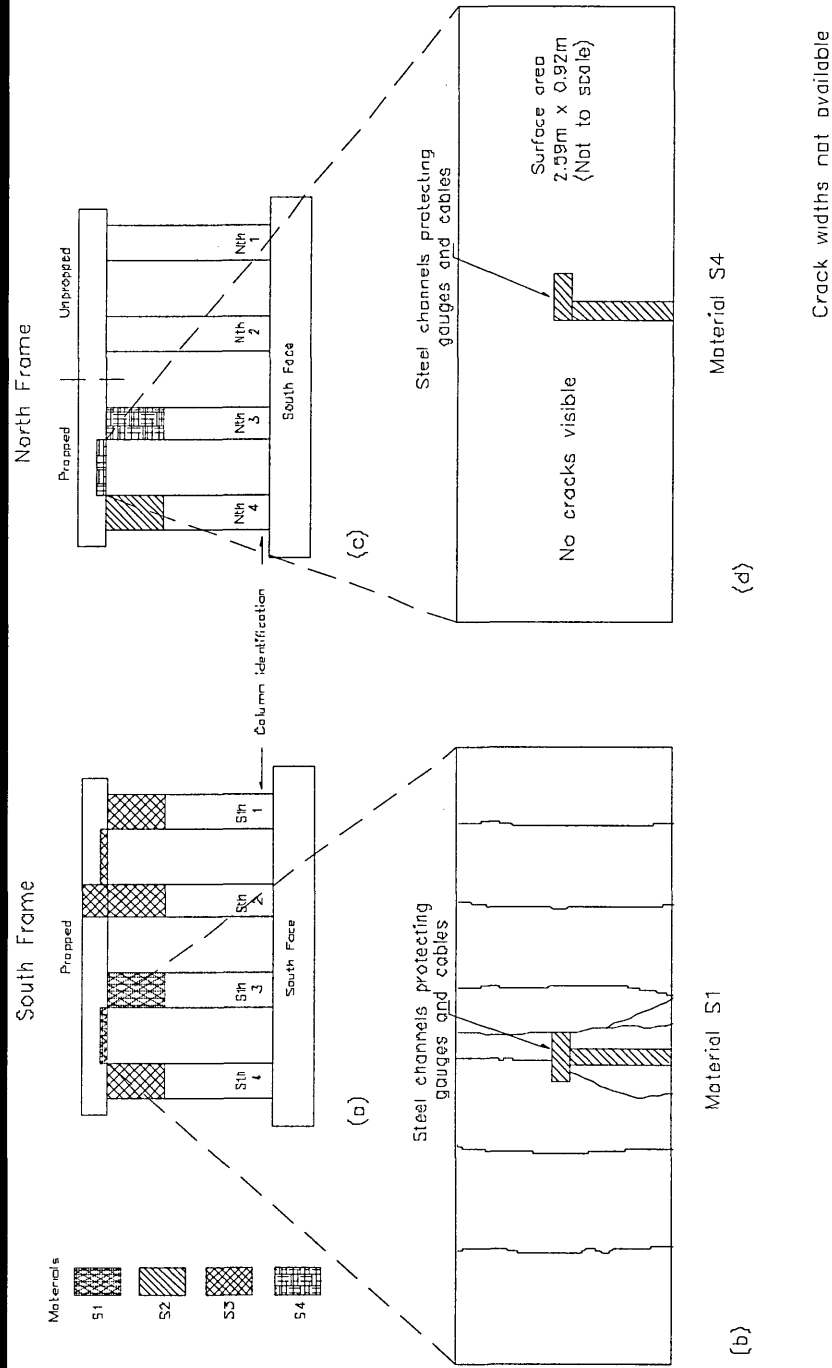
Cracking patterns in soffit repairs at Sutherland Street Bridge
